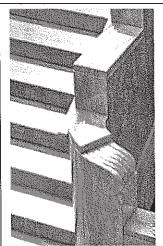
Detail, turnout of balustrade at bottom of staircase, first floor.
